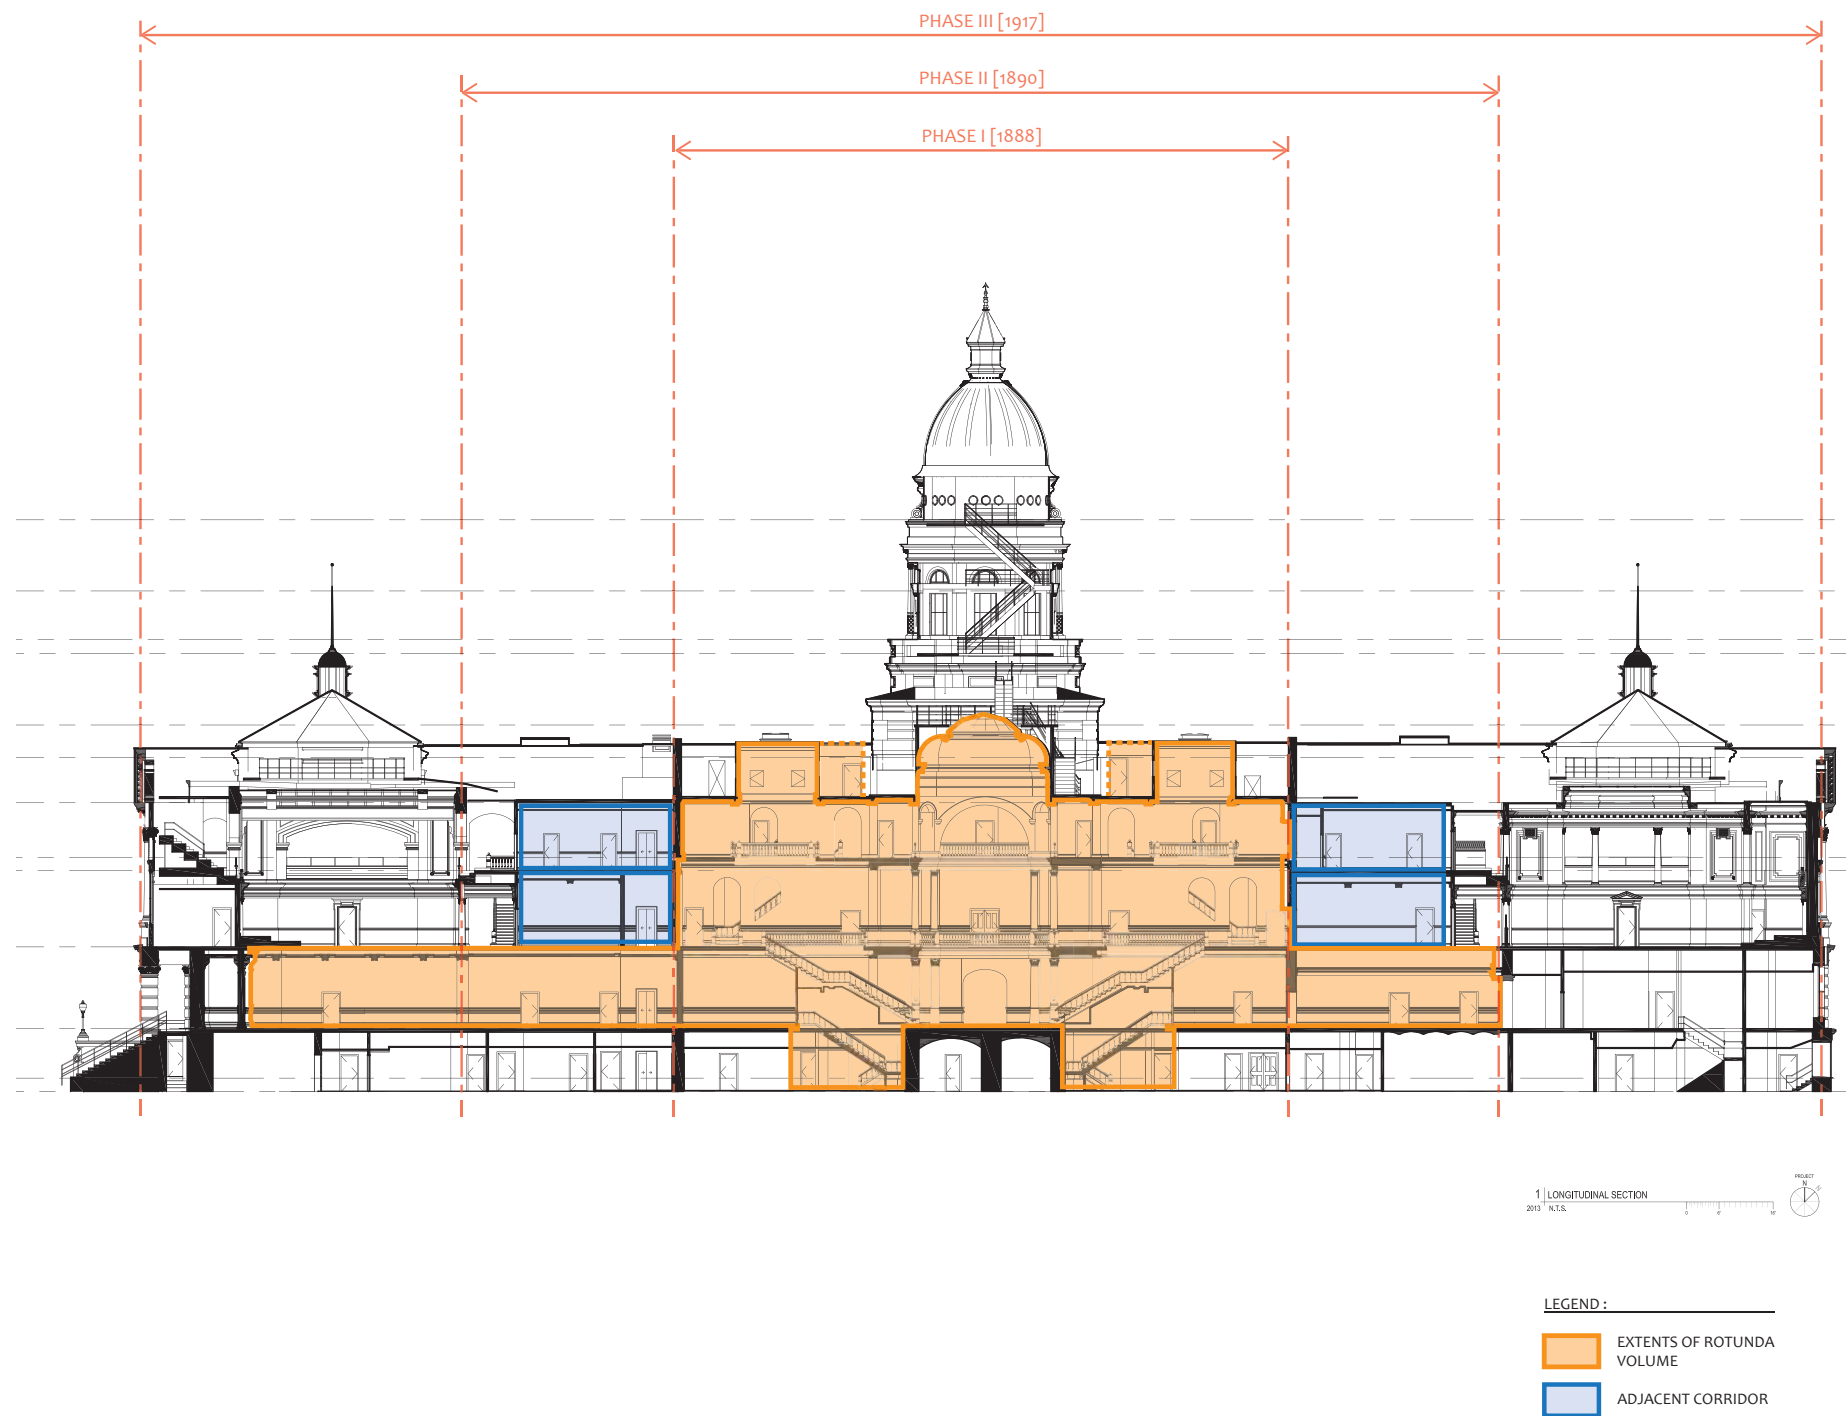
Longitudinal Building Section Illustrating the Single-Volume Nature of the Existing Building.
